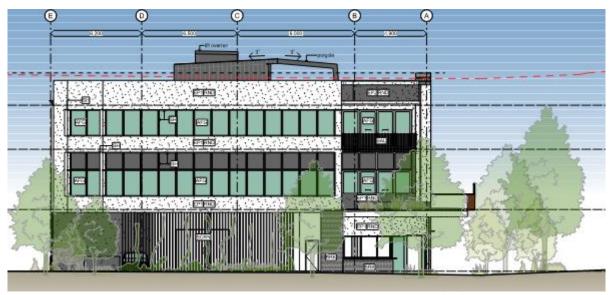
East Elevation. Source: Sparc - Issue J dated 05/03/24
